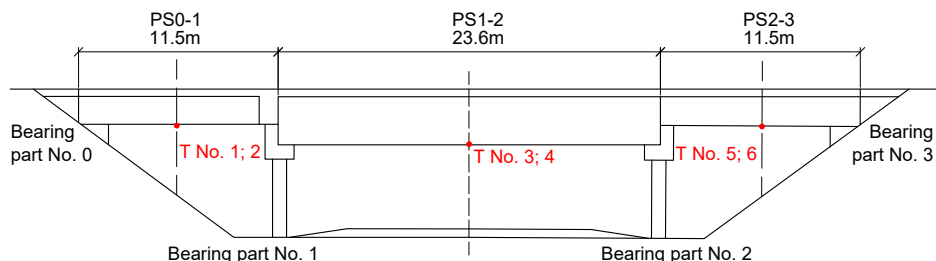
Layout of strain gauges on reinforced concrete span structures of railway overpasses: overpass according to the scheme 11.5+23.6+11.5, PS0-1, PS1-2, PS2-3 – overpass span structures; T No. 1, T No. 2, T No. 3, T No. 4, T No. 5, T No. 6 – FLM-60-11 strain gauges; O No. 0, O No. 1, O No. 2, O No. 3 – backfill abutments and intermediate supports
